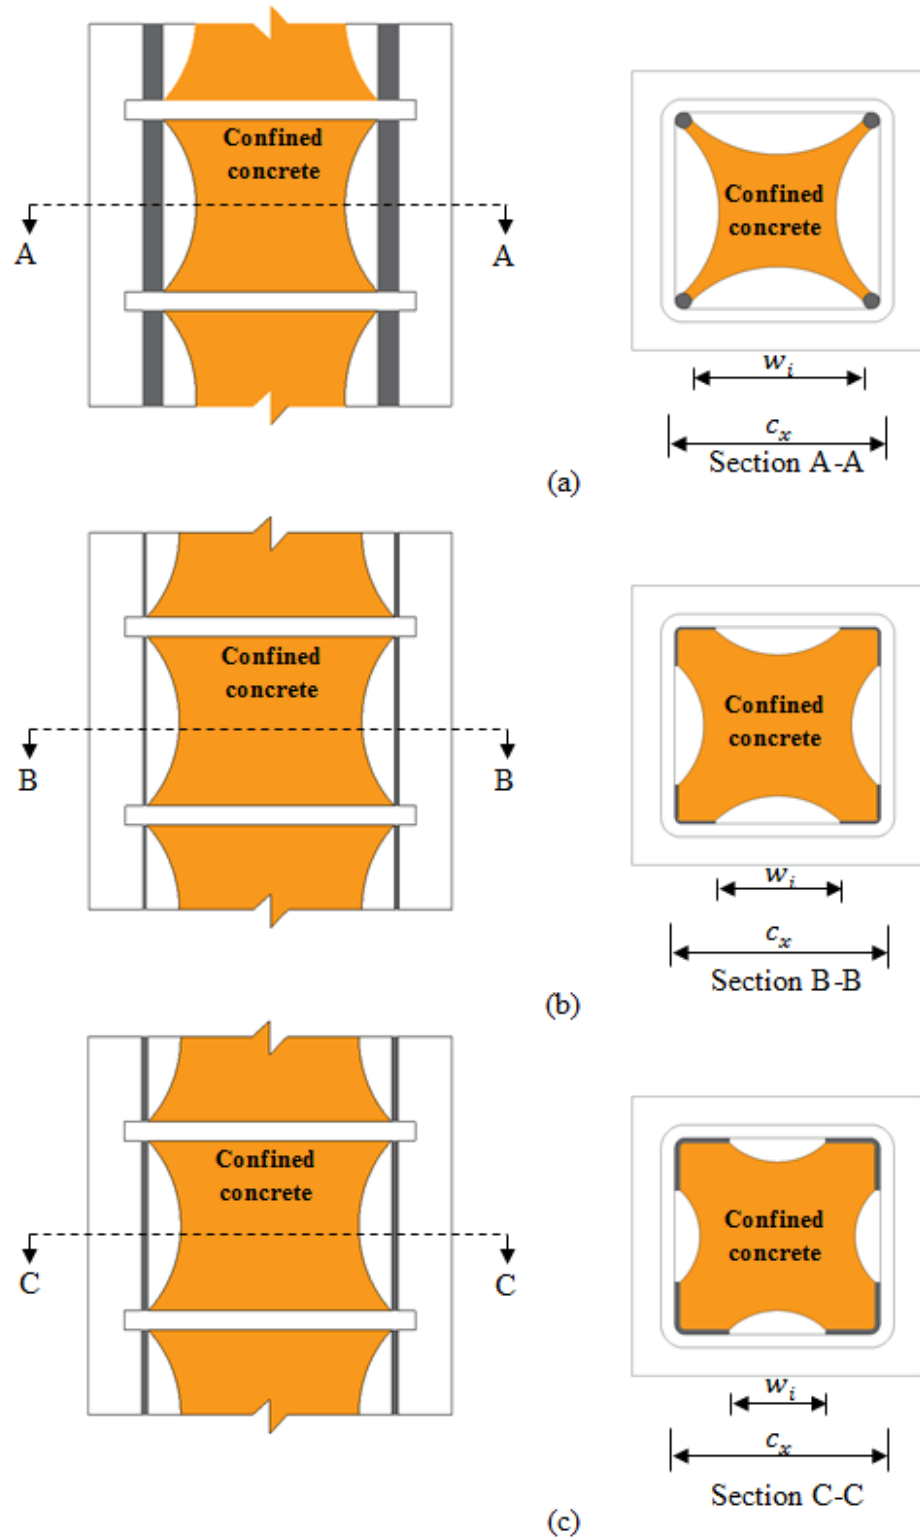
Arching action in confined concrete columns: (a) Transverse ties and N12 steel bars, (b) Transverse ties and A30 SEA sections and (b) Transverse ties and A40
